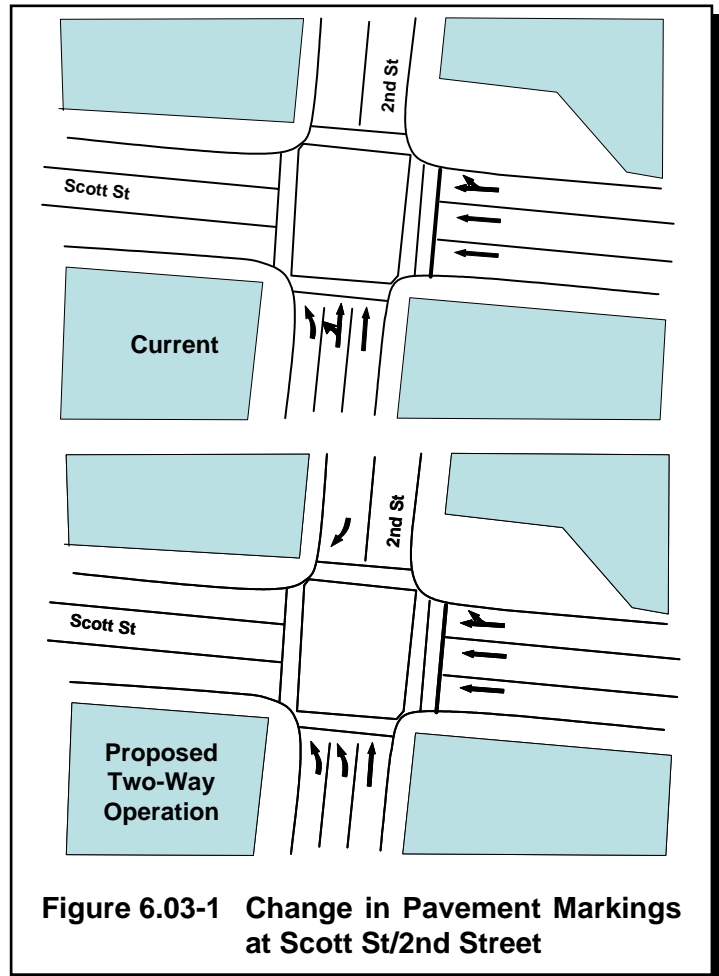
Change in Pavement Markings at Scott St/2nd Street
